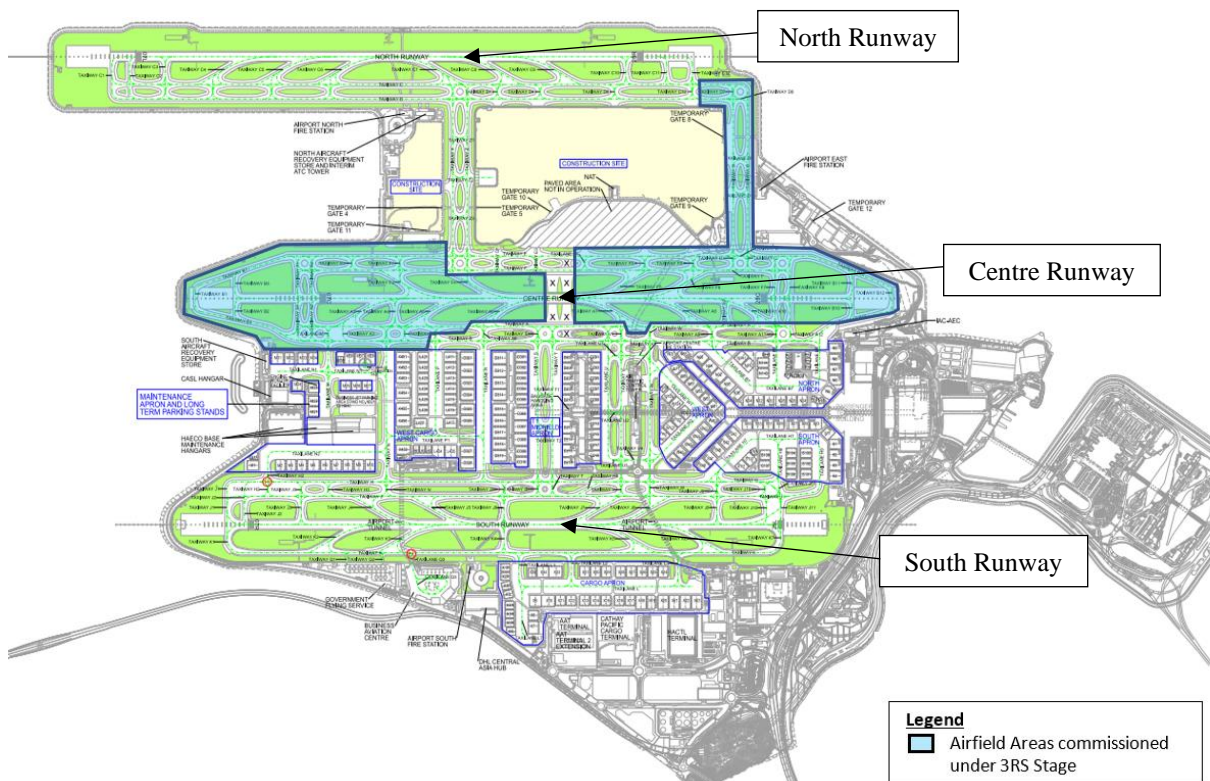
Aerodrome Layout Plan of HKIA (3RS Stage)
